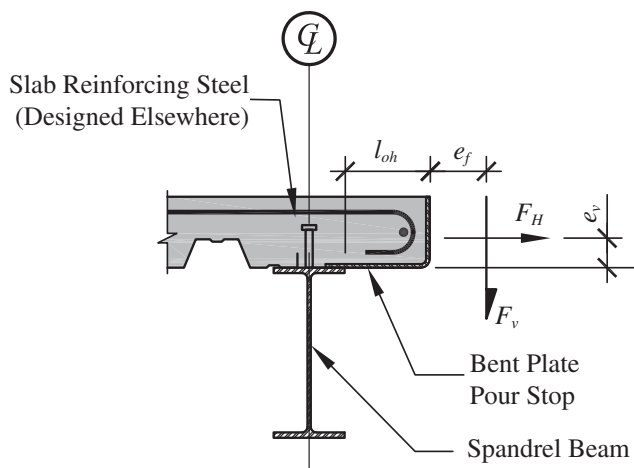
Slab edge with bent plate as pour stop supporting façade loads.
